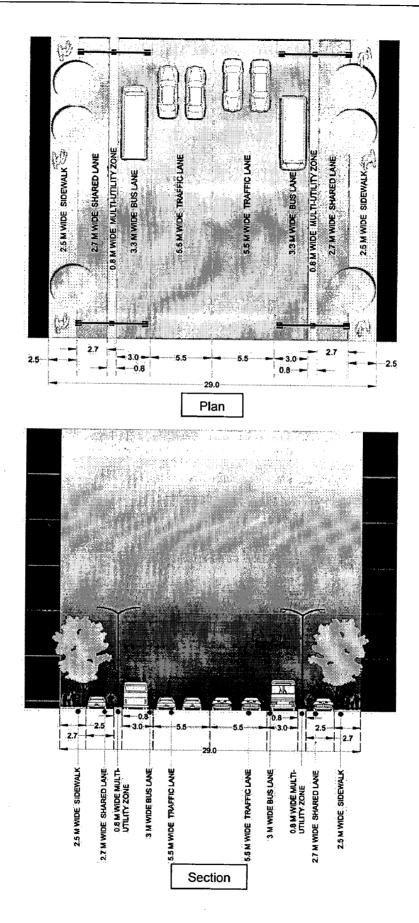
Street section for 29m width – Equitable space for all road users Source: By Author
